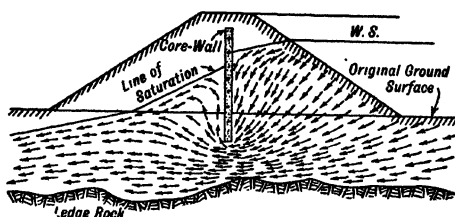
Showing the General Condition of Flow through an Earth Dam and under a Core-wall.
